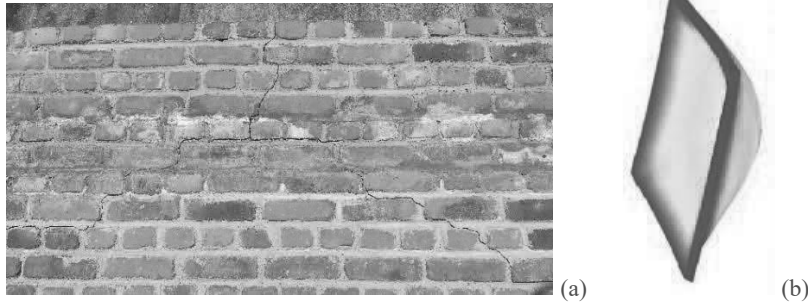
(a) Failure mode of reinforced C-shaped structure: a Y-shaped crack developed in the face loaded walls. To note this crack did not develop in the bed joints where titanium rods were installed, (b) Schematic and simplified representation of the deformed shape of the face-loaded wall.
